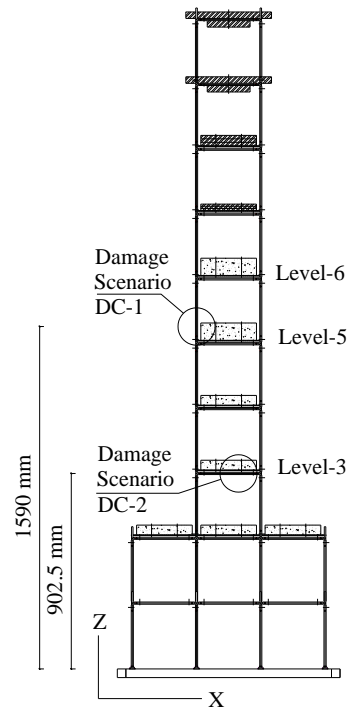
Location of damage scenarios, DC-1 and DC-2, on the damaged multi-storey building model
